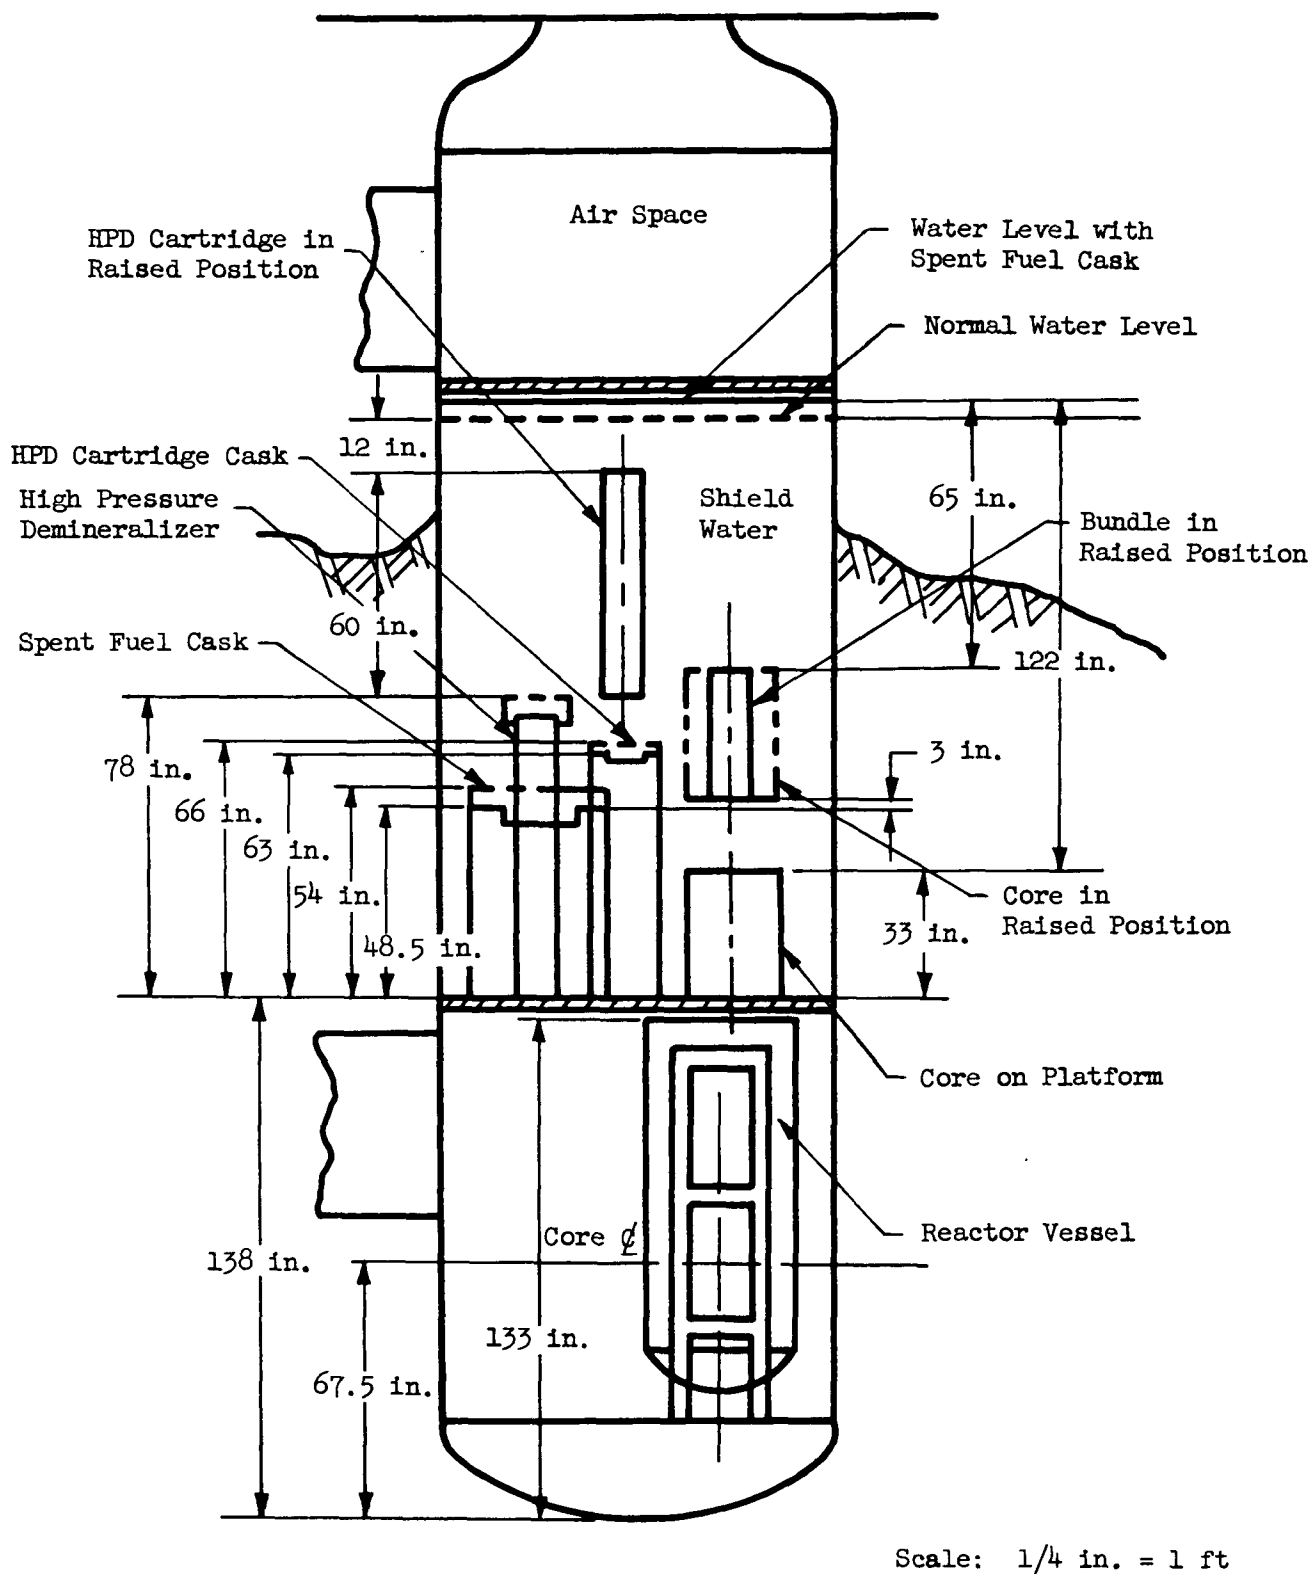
Reactor Package Showing Spent Fuel Cask (contained version)
